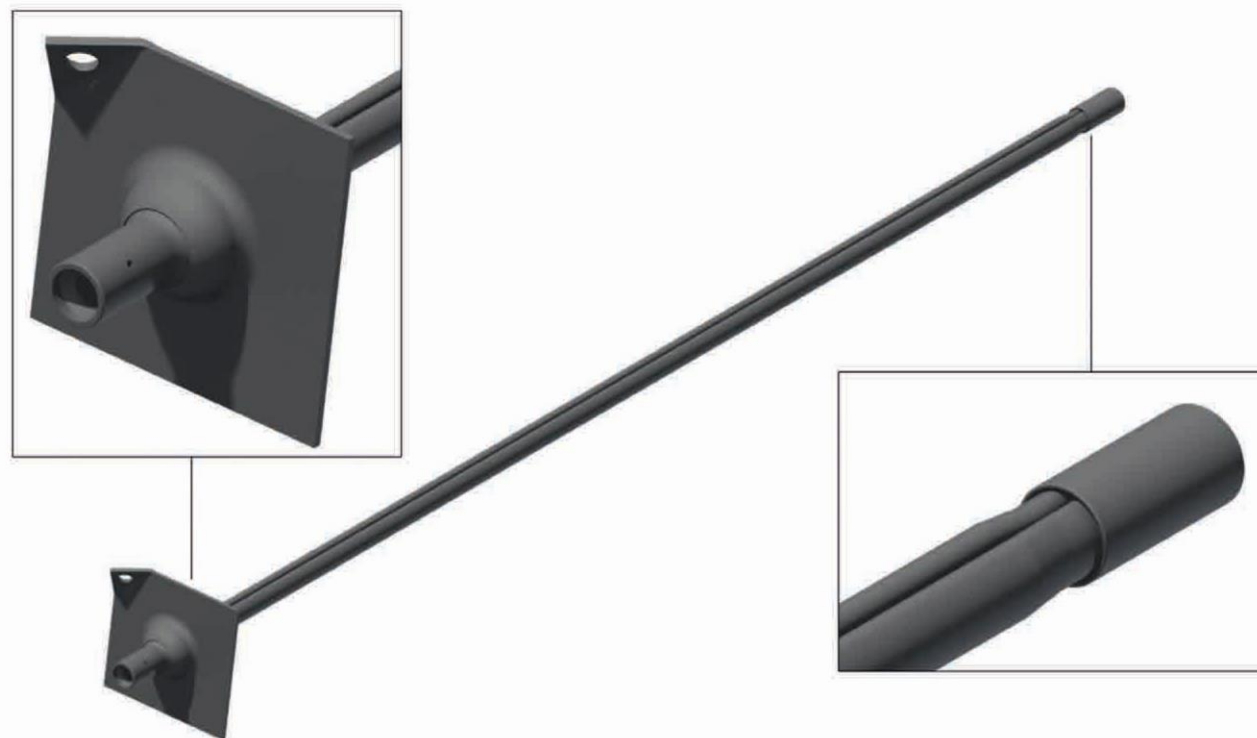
SSAB ERB consists of folded steel tube with upper bushing and inflation bushing welded at each end of the tube. A specially designed adjustable face plate is delivered as an option.
